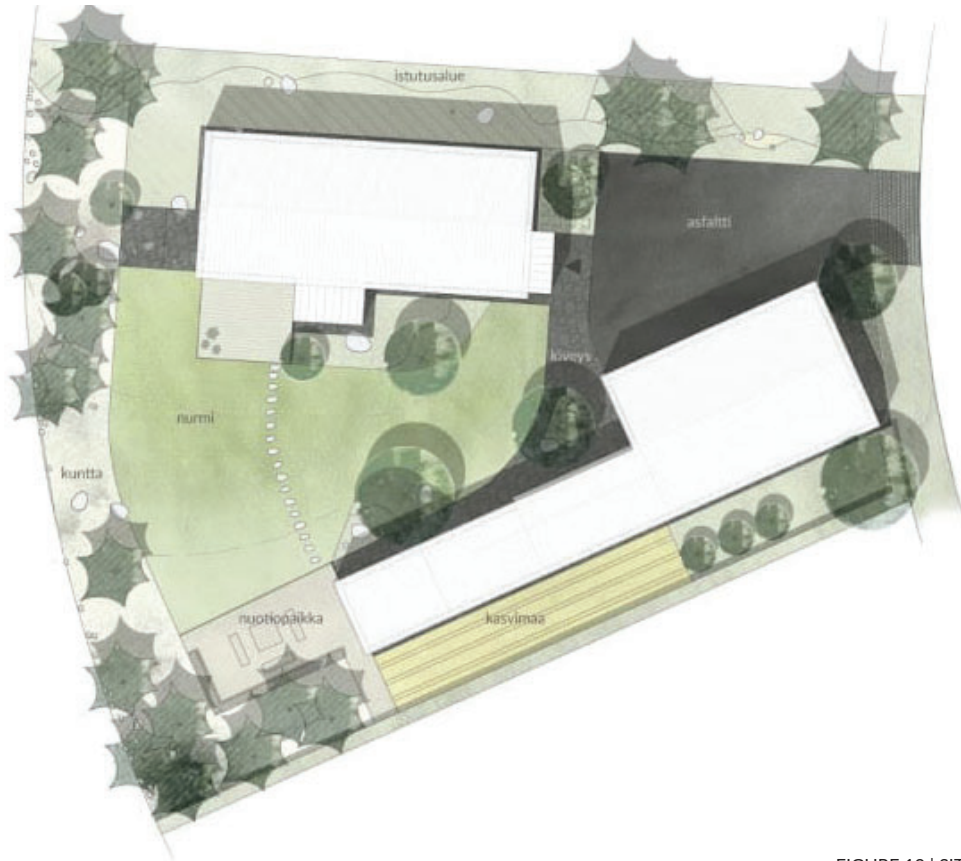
| SITE PLAN, PHOTO CREDIT | HONKARAKENNE
